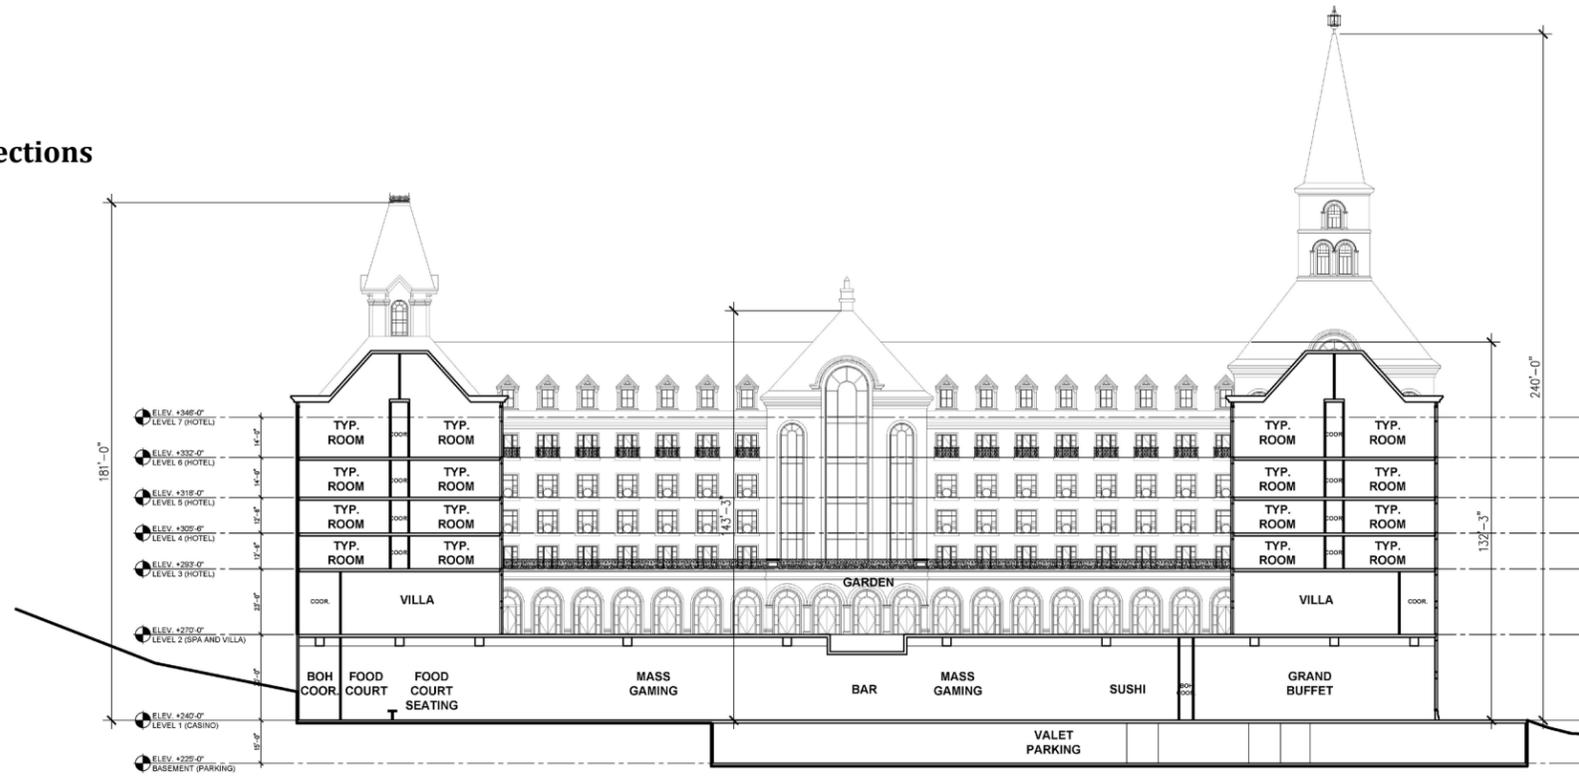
a-27 Building Elevations and Perspectives -Garden Building Elevation
